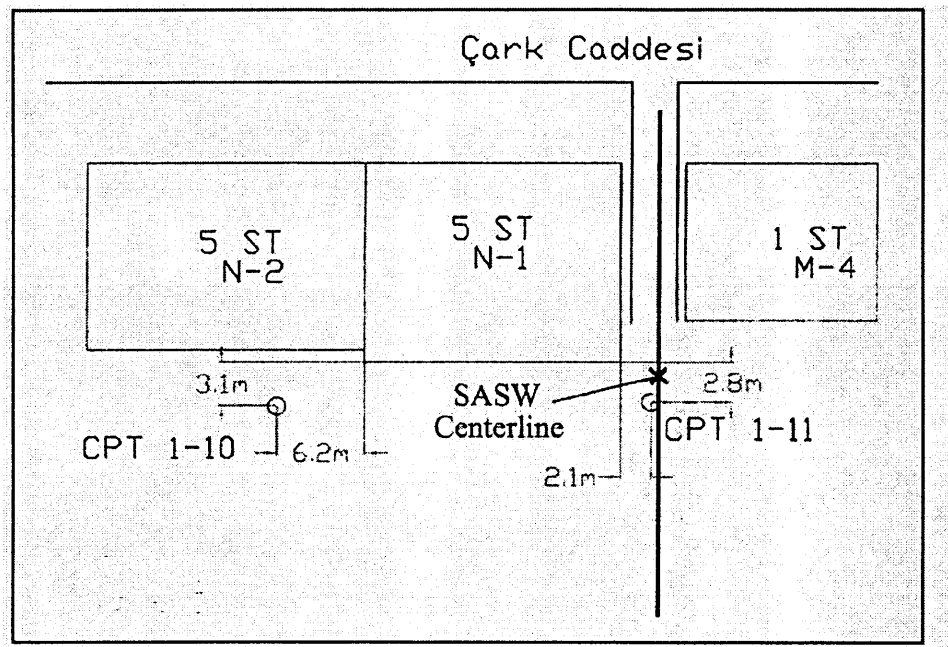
Plan view of Site 1-11 showing the location of one SASW centerline (modified from <http://peer.berkeley.edu/turkey/adapazari>).
